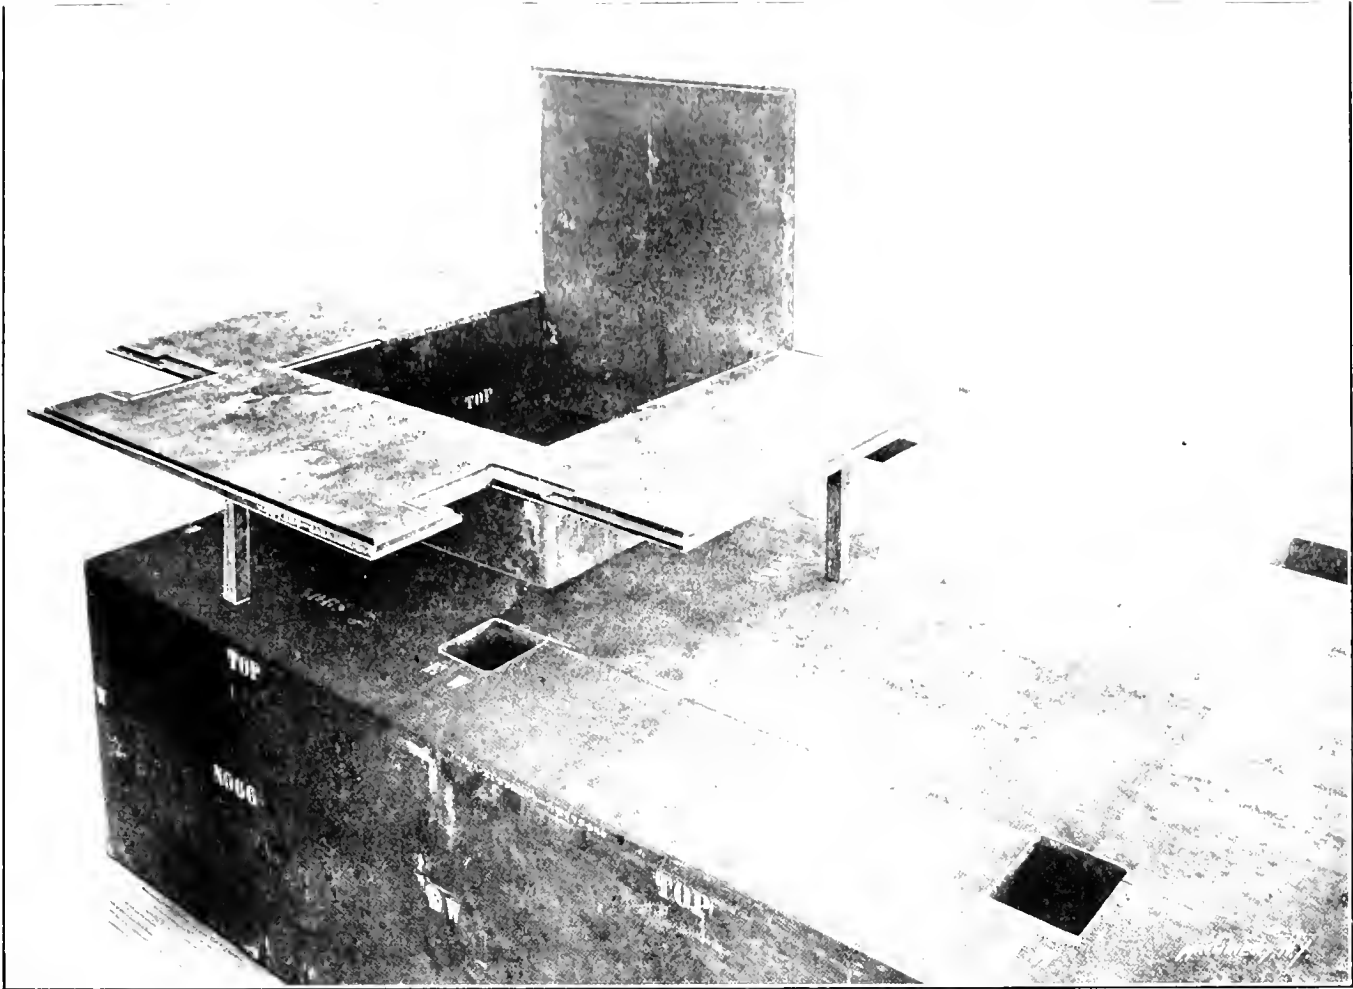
Elevator and Stairway Well, Partly Assembled, note the Complicated Machine Work at the Joints.
